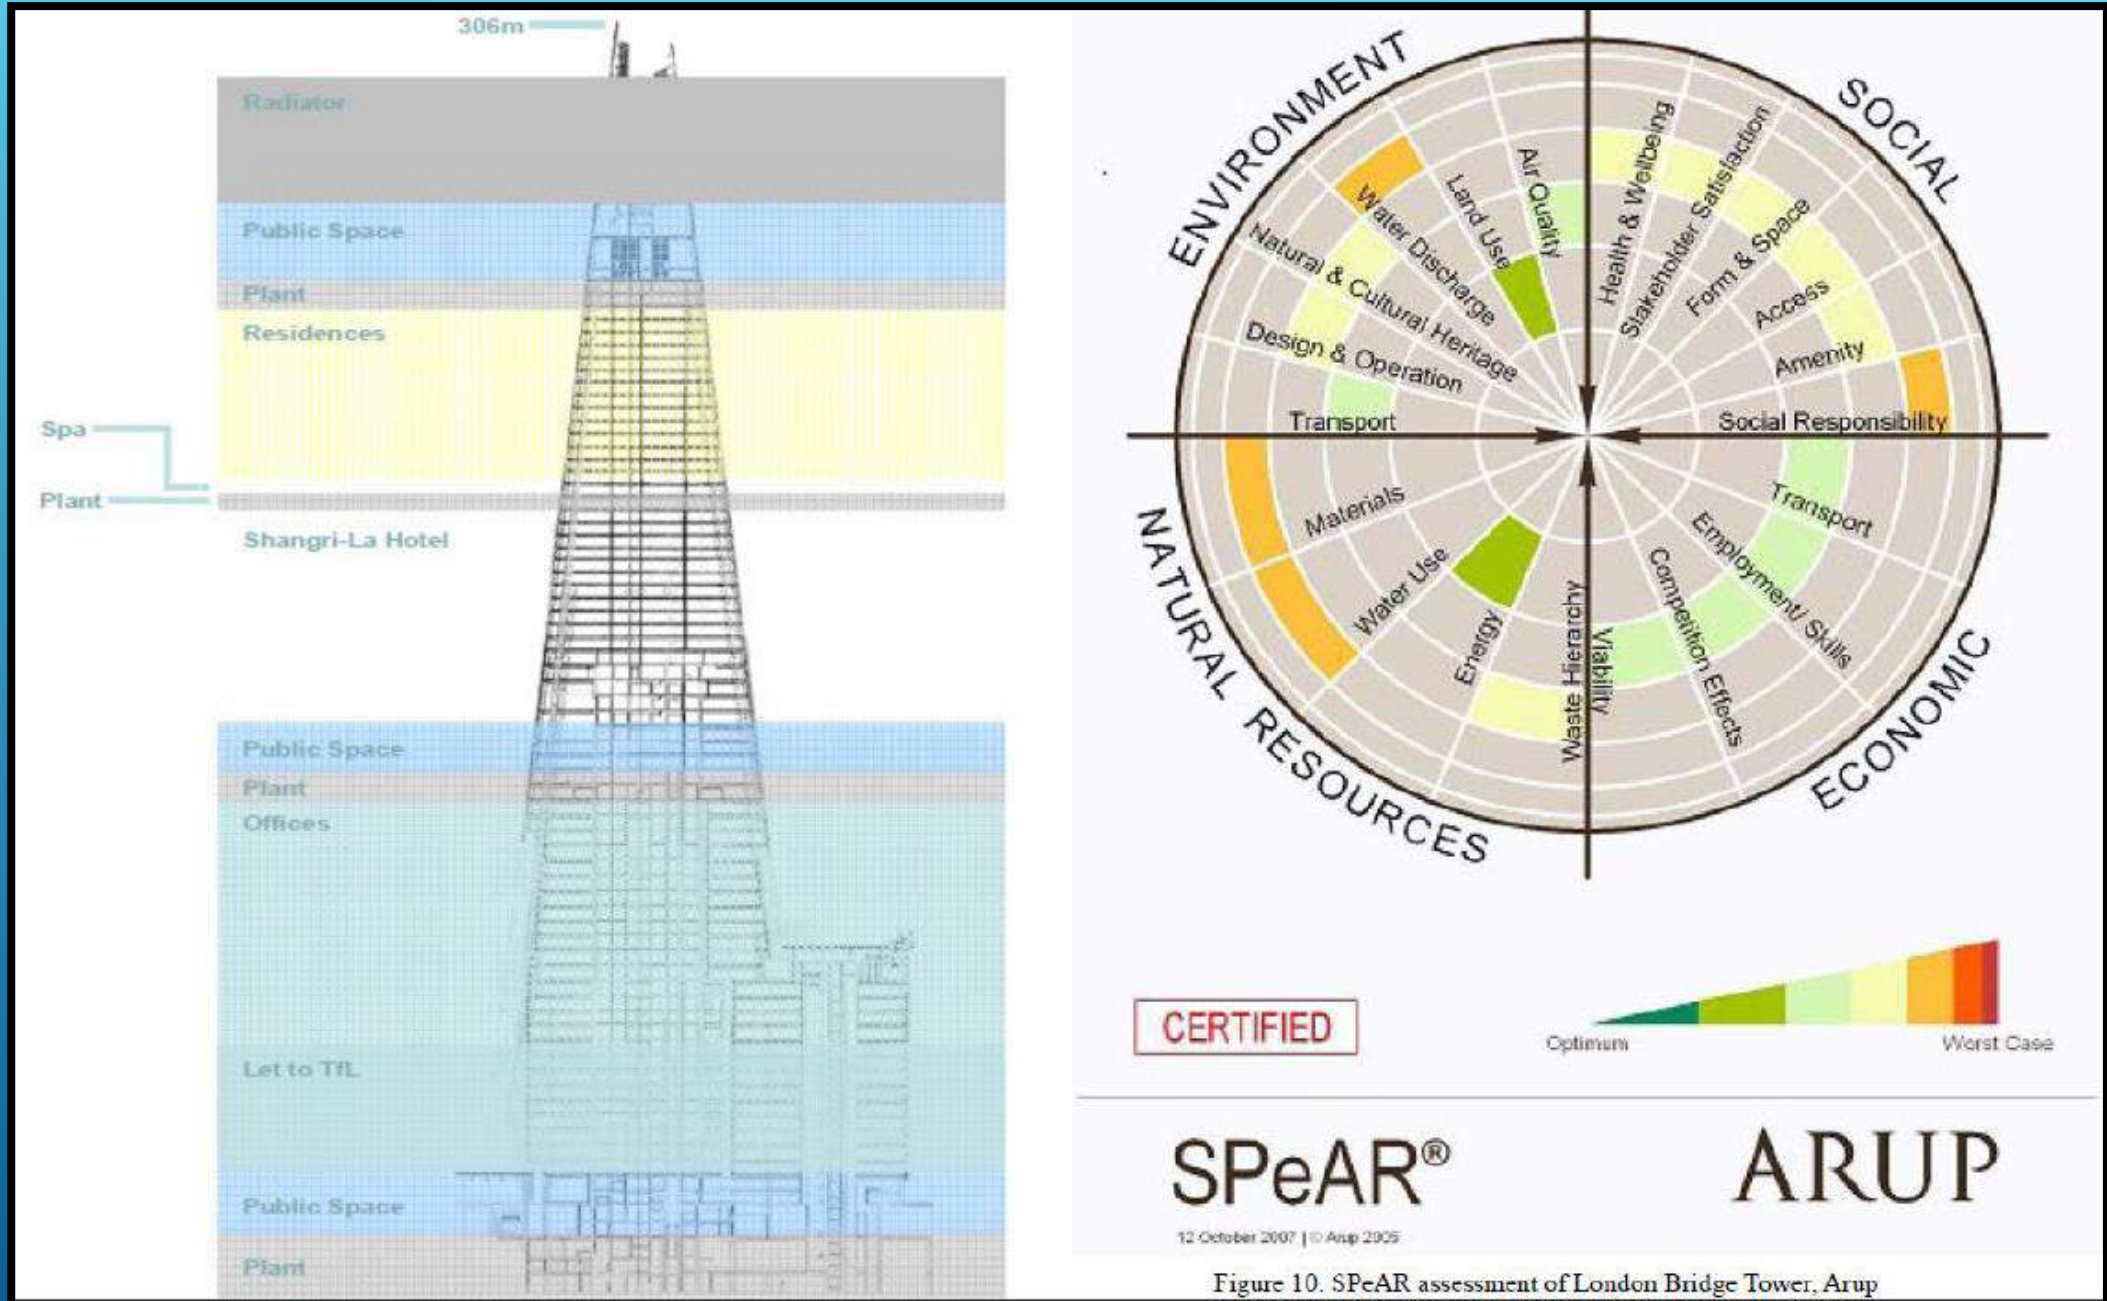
SPeAR assessment of London Bridge Tower, Arup
